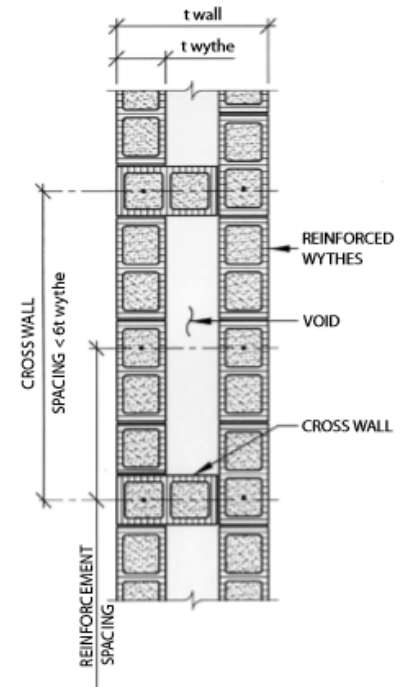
Illustration from STRUCTURE magazine article (May 2008), Designing Tall Masonry Walls
